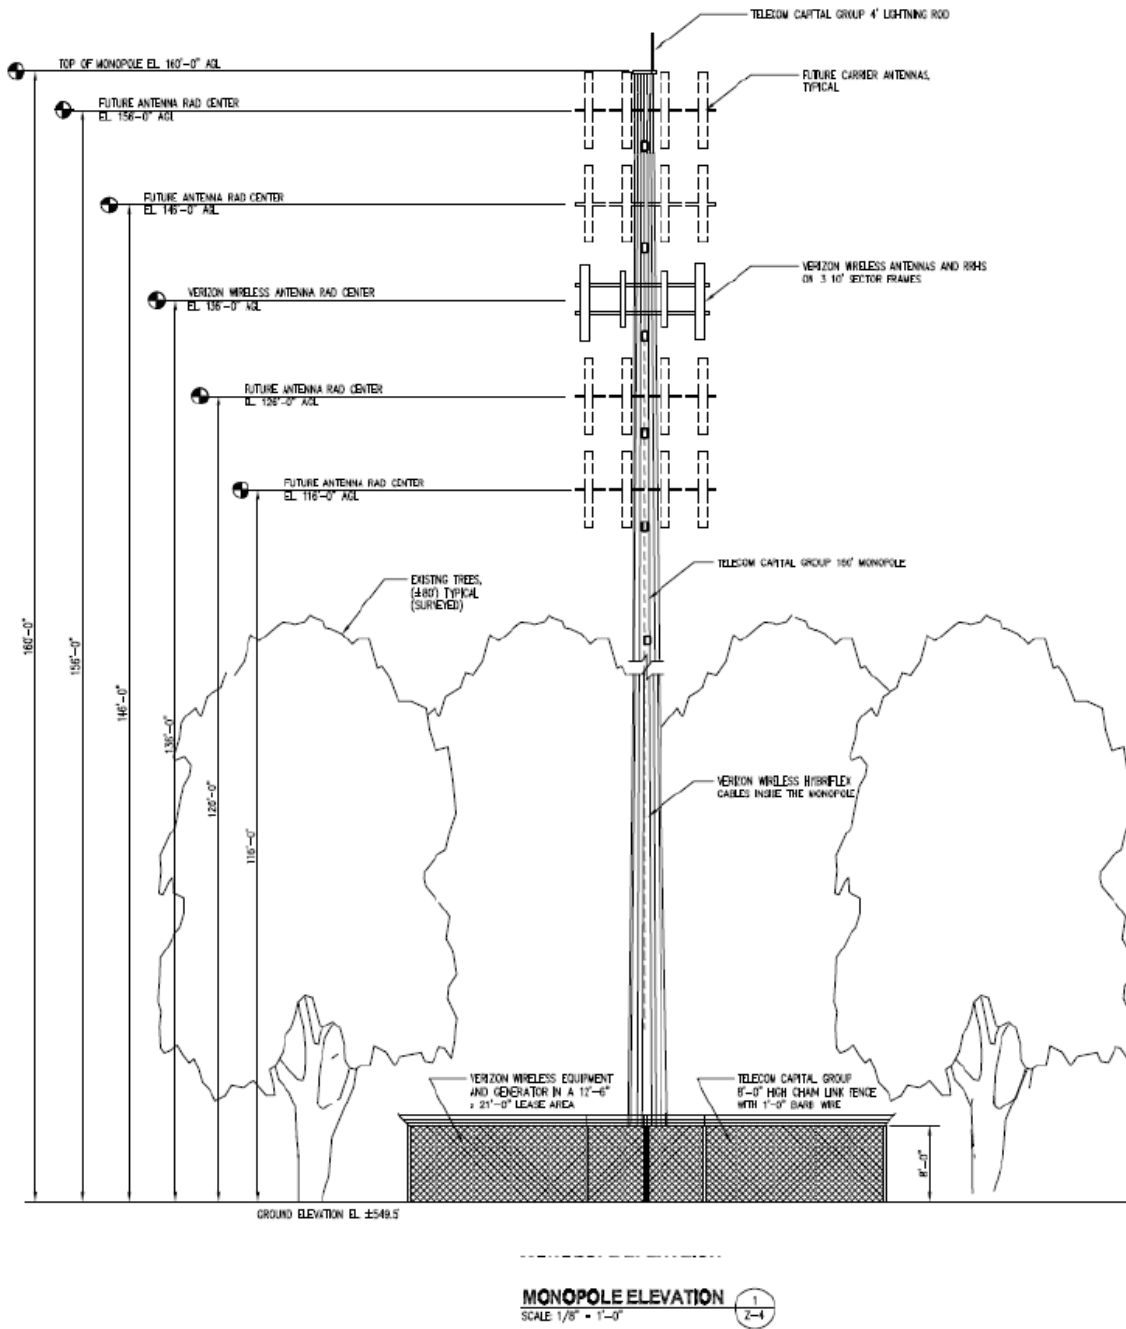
, p. 8, Figure 5 – Monopole Elevation
